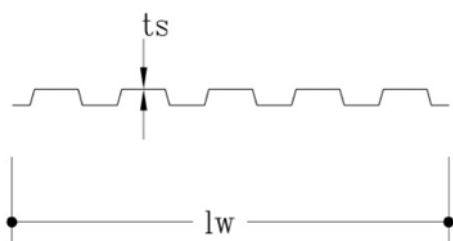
Schematic Cross-sectional Area of a Profiled Steel Plate
